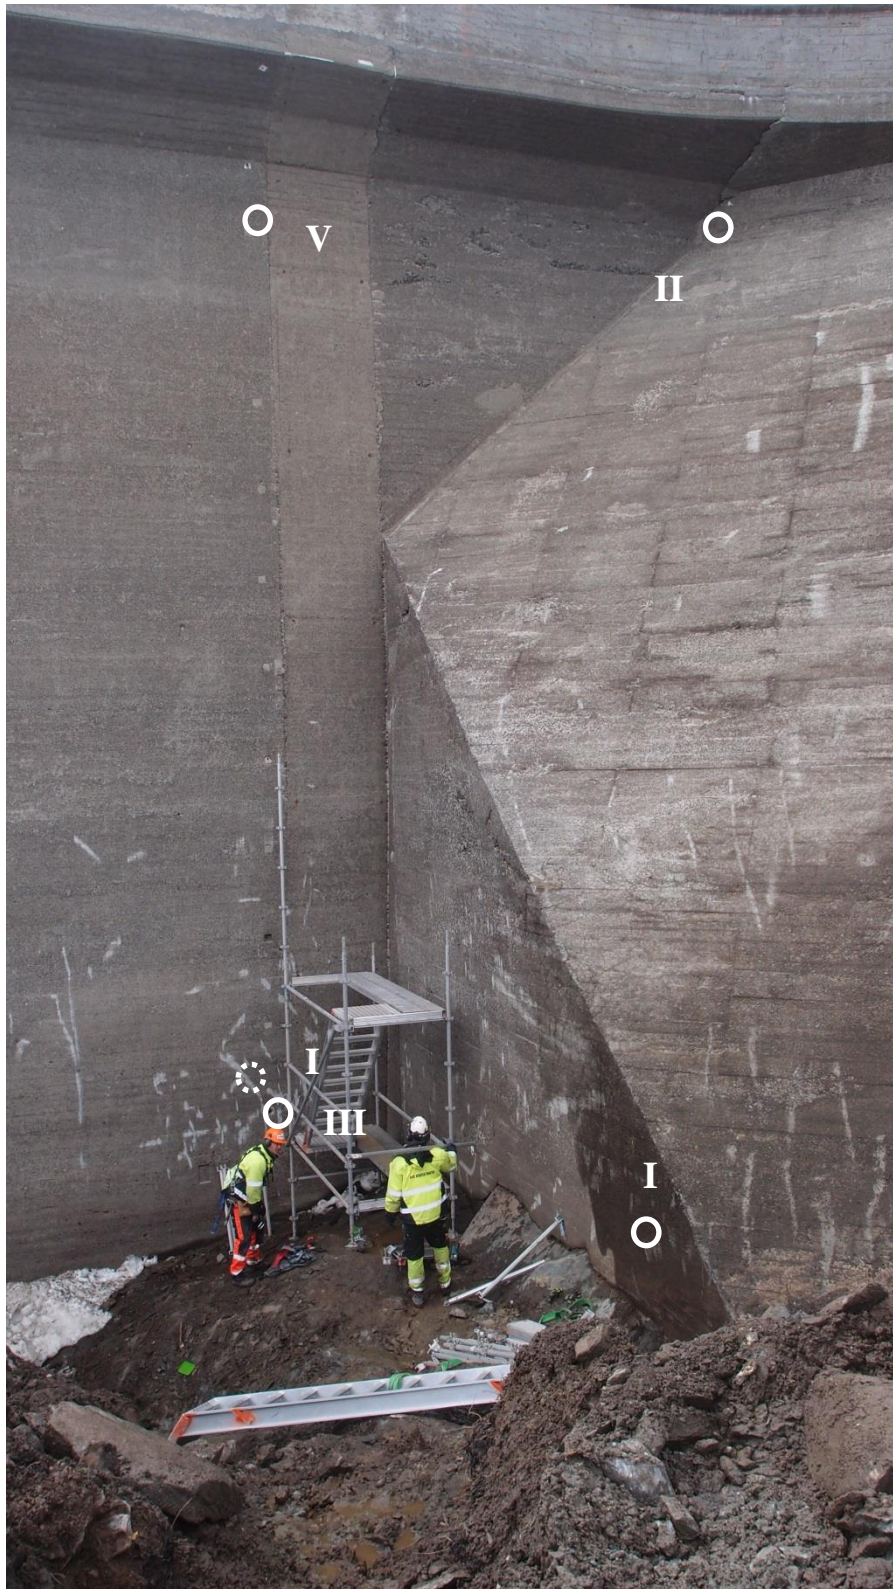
Upstream face of the connection point between the arch dam, the slam dam and the abutment wall (Lindgård et al., 2015).
